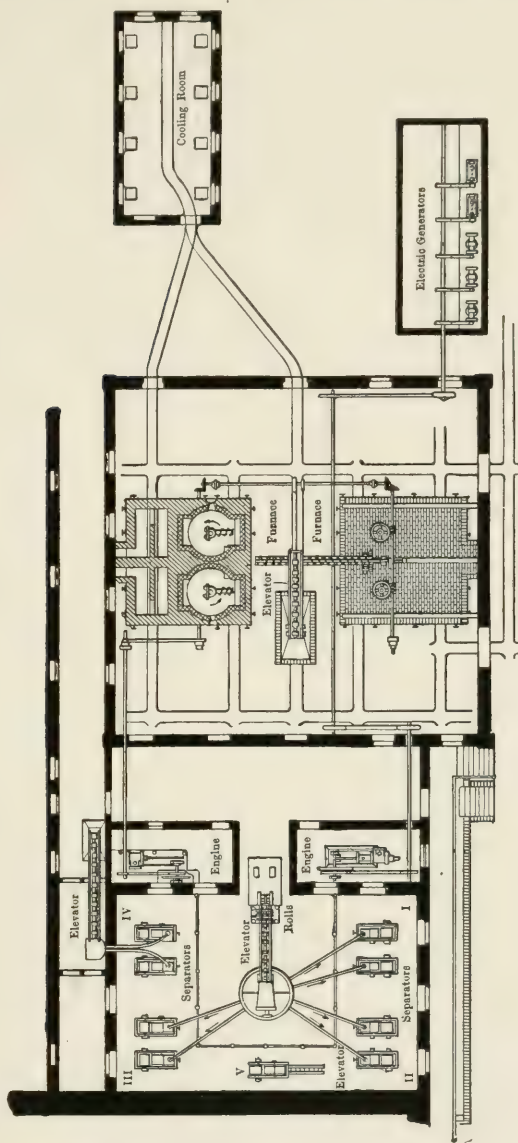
PLAN OF SEPARATION WORKS, FRIEDRICHSEGEN, GERMANY.
